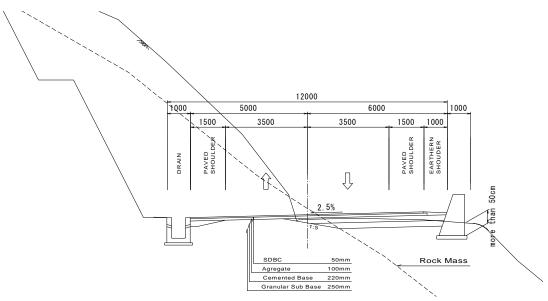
Typical Cross Section (Areas with Bedrock)
